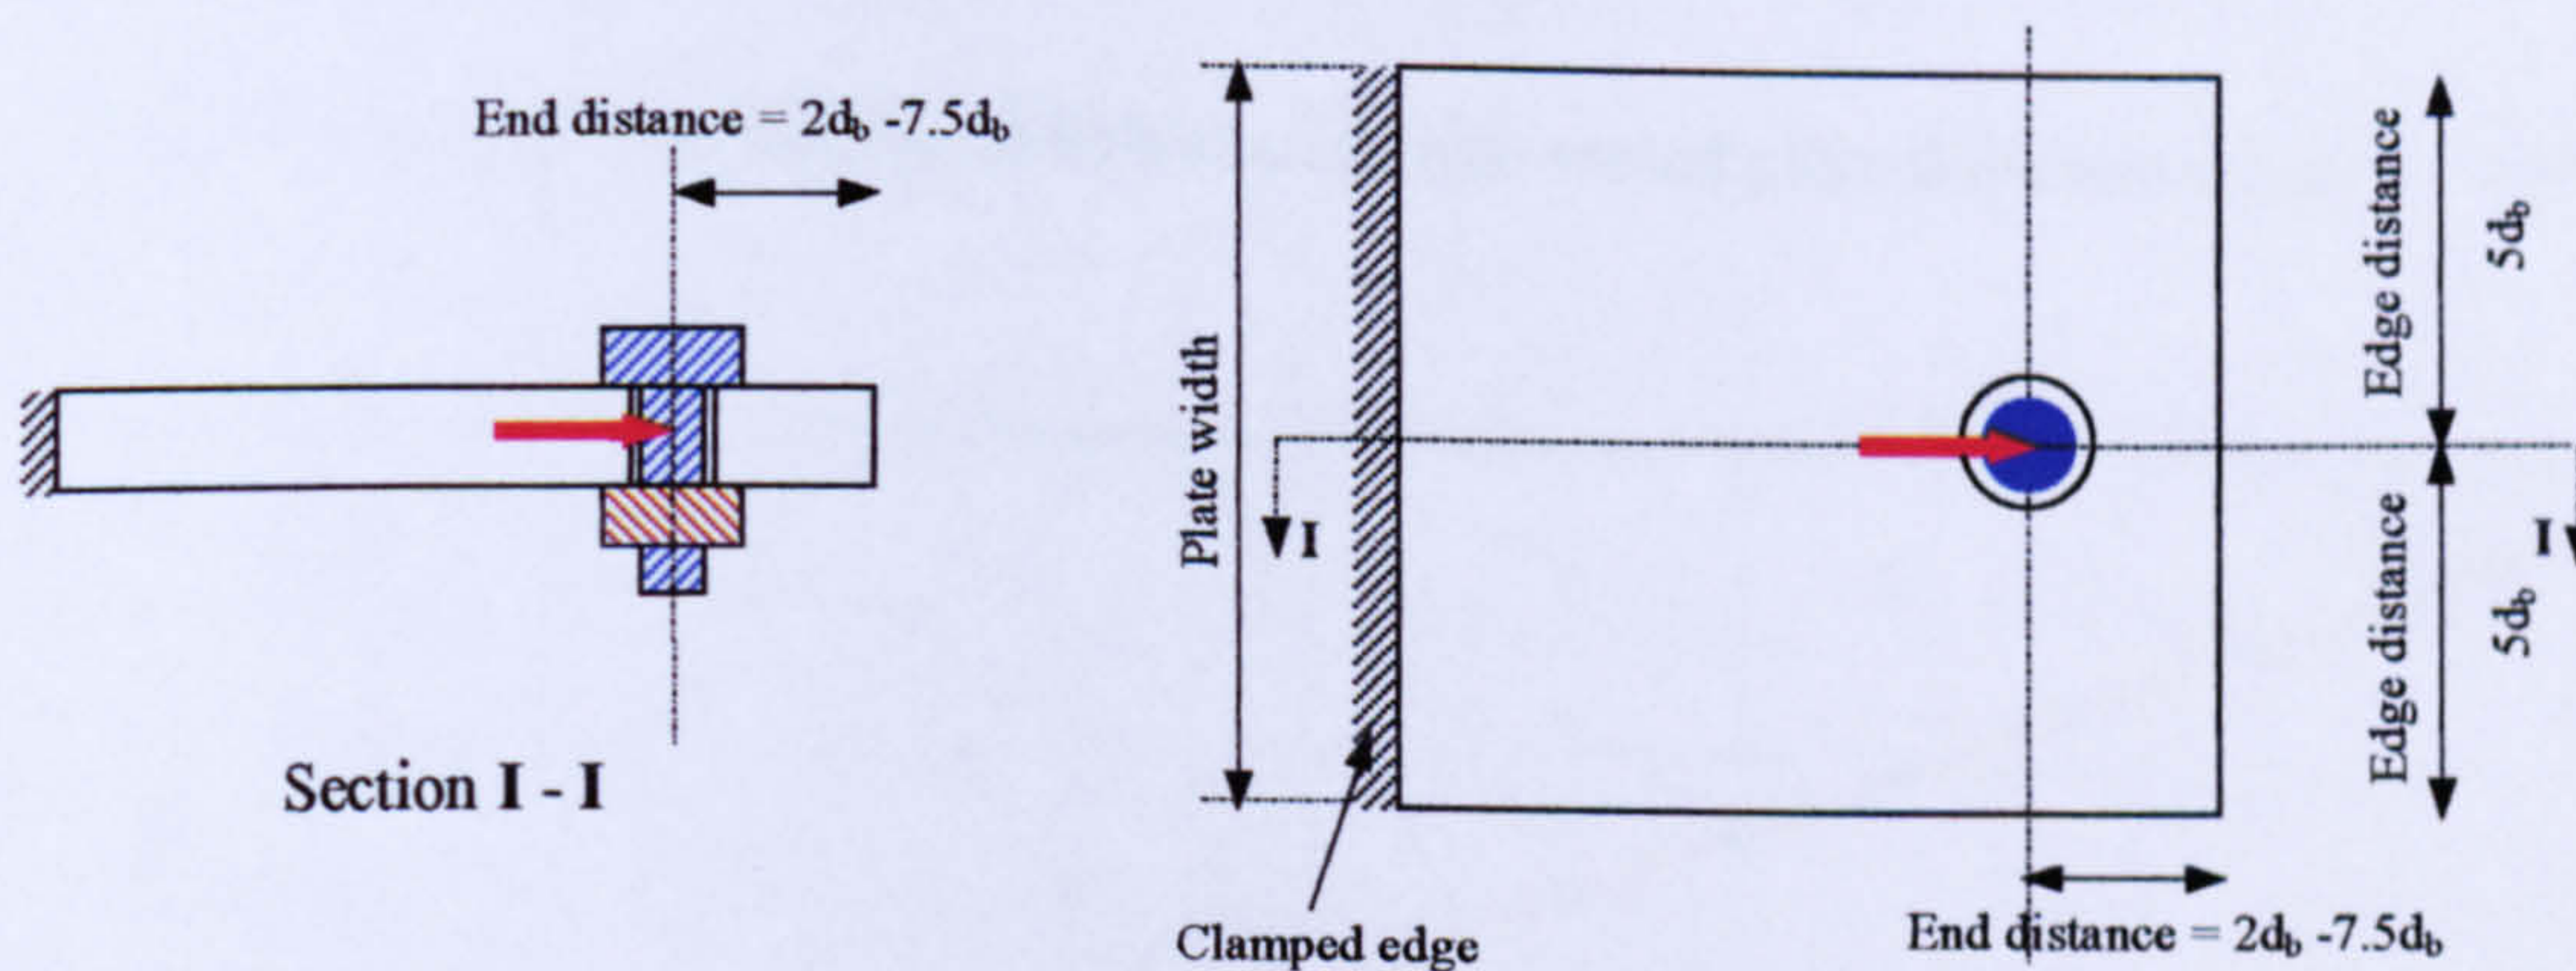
Geometrical detail of the plate studied under bolt bearing
